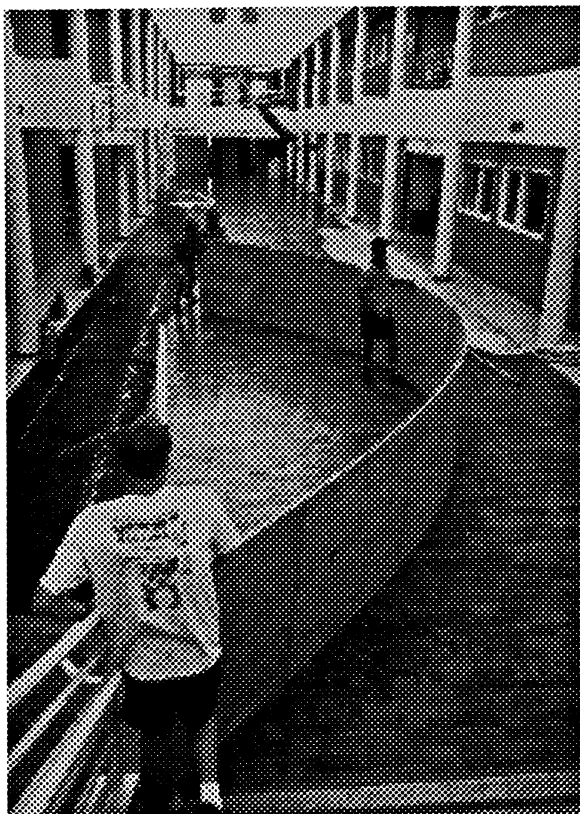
A series of full scale plywood cross-sections were constructed and tested to failure for selection of proper plywood type, thickness and orientation; and for examination of scarf joint dimension, epoxy specifications and application, and quality control of joining sequence. Quality assurance in the epoxy joints proved as critical a procedural issue as material specification.
